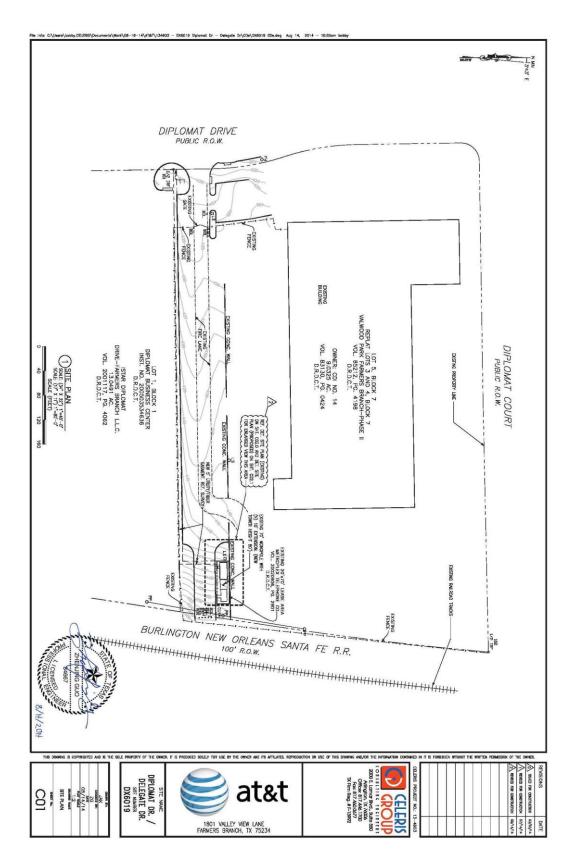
EXHIBIT "A" to Ordinance No. 3302 Site Plan (cont)
